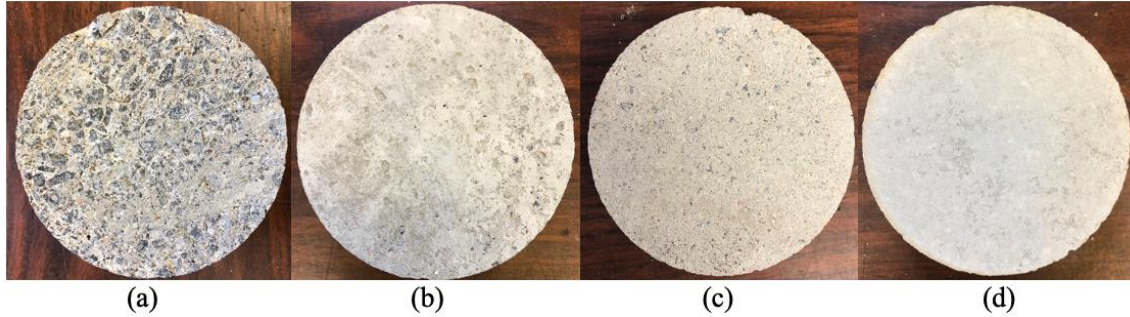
Interface bond failure of the shotcrete-concrete specimens under shear load; (a) chipped, (b) pressure-washed, (c) sandblasted, (d) as-cast (unprepared)
